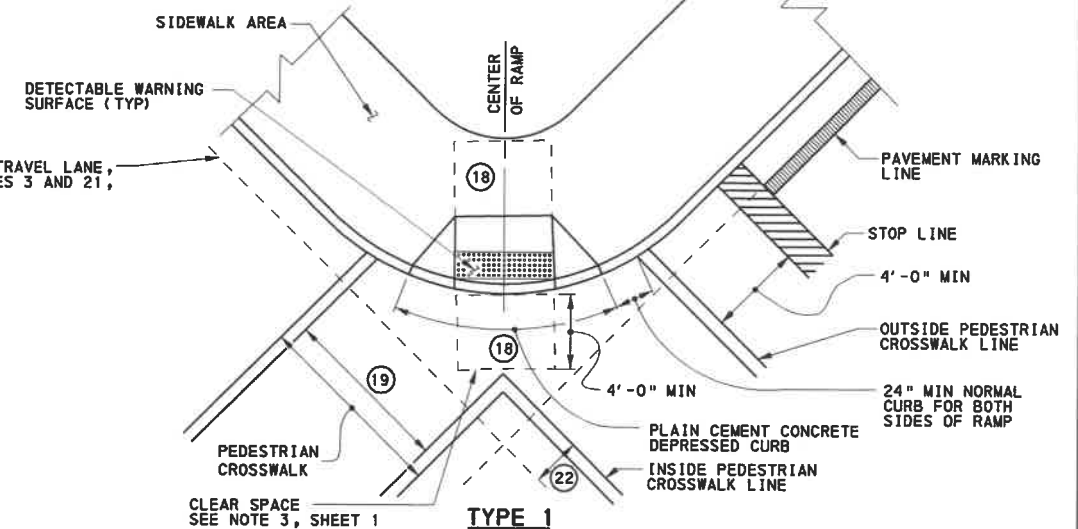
DETAIL A CLEAR SPACE AT CROSSWALK MARKINGS (DIAGONAL - REQUIRES ASSISTANT DISTRICT EXECUTIVE APPROVAL)
